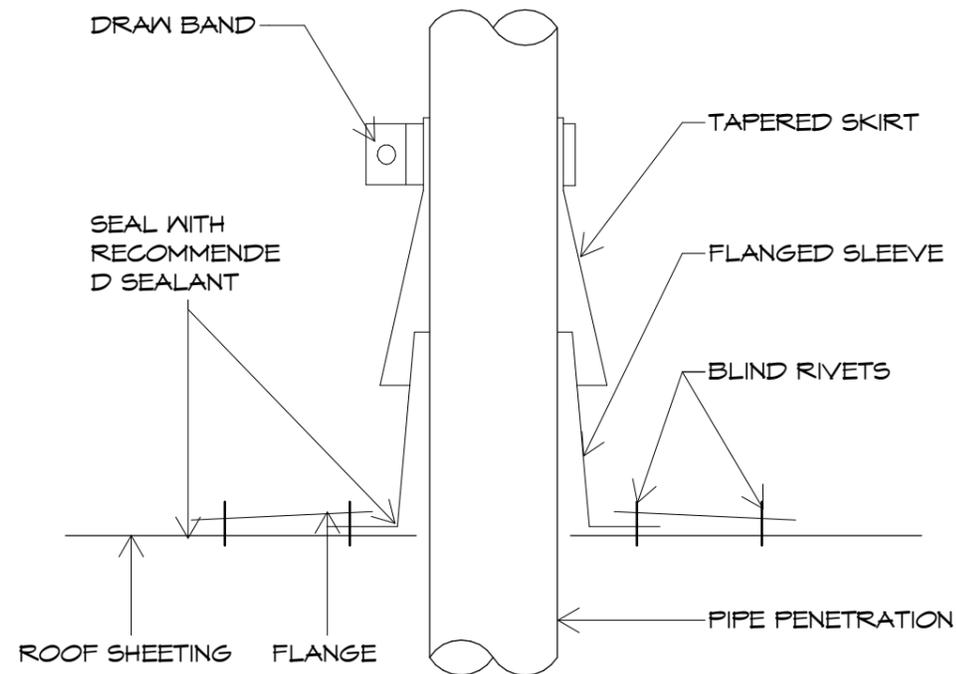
COLLAR FLASHINGS TYPICAL ROOF PENETRATION FLASHING DETAILS
